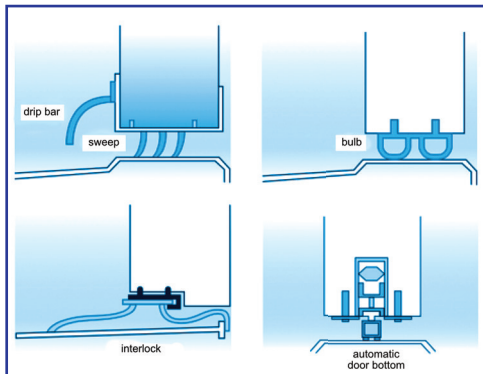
Installation of air tightness of different weather stripping for flooring and door frames
